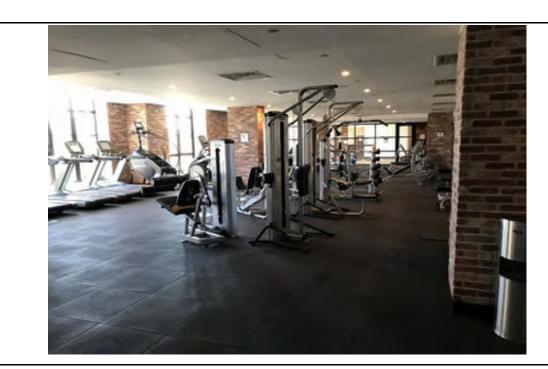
First floor concrete slab covered with soft tiles within the gym, facing southeast. 30 March 2021.
